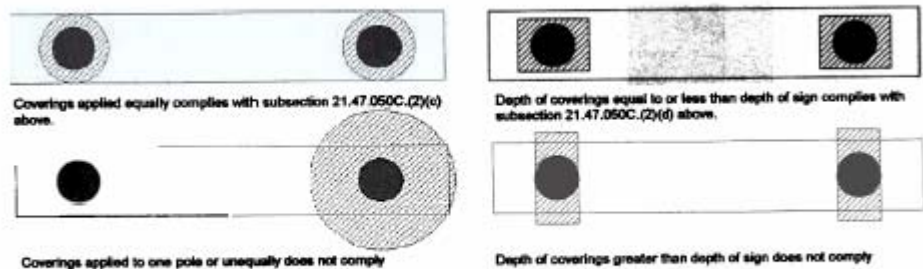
Examples of pole wrap. Poles depicted in plan view.
